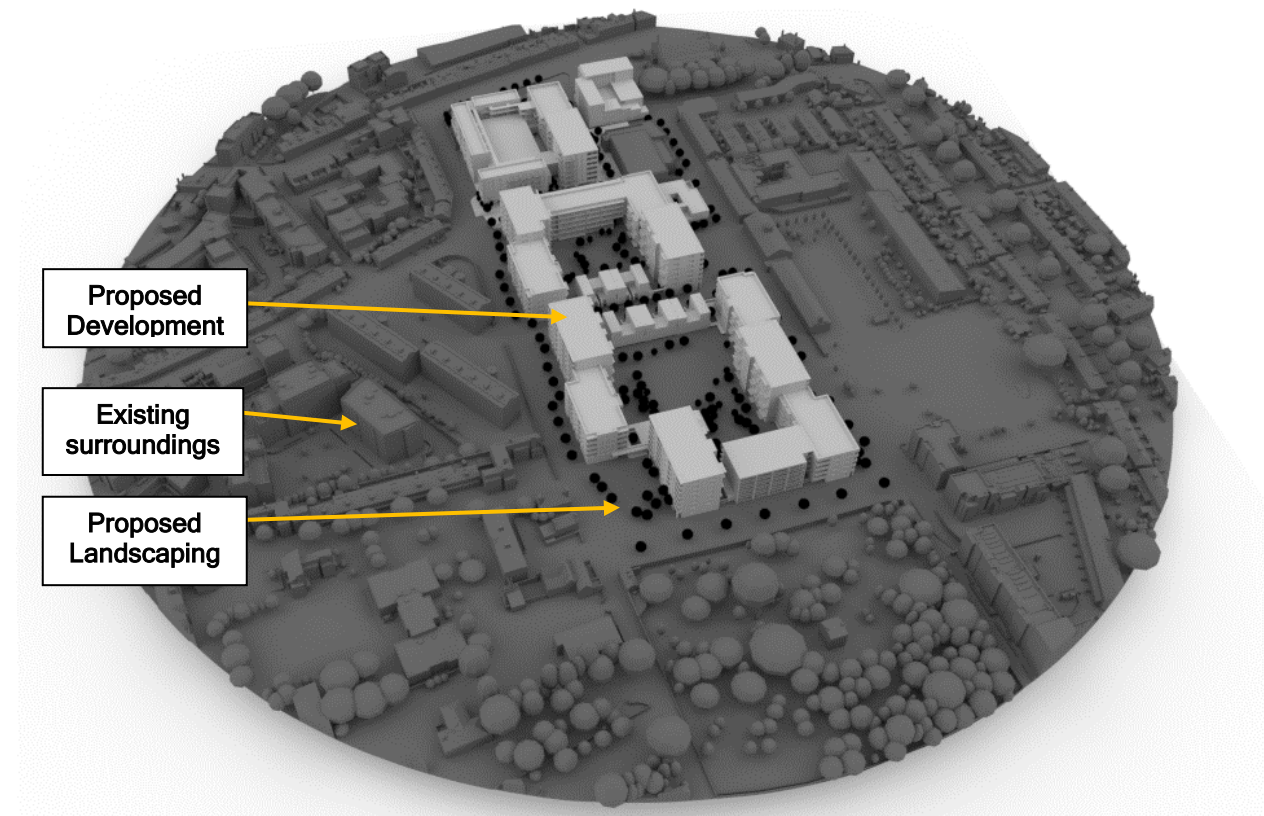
3D Model of Proposed Emmet Road Development and Neighbouring buildings
